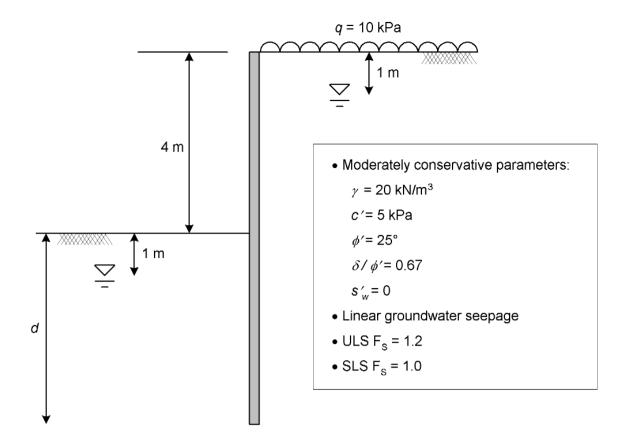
Example 1 - cantilever wall: effective stress analysis
